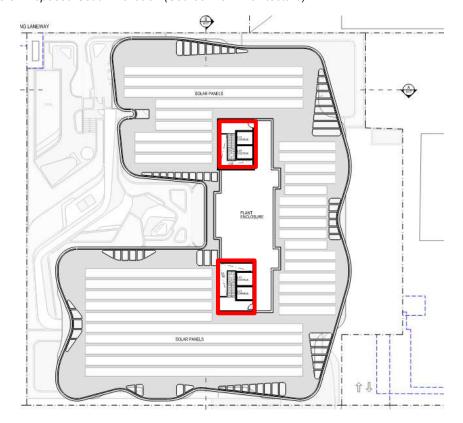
Roof plan - Lift overruns marked red (Source: EJE architecture)
